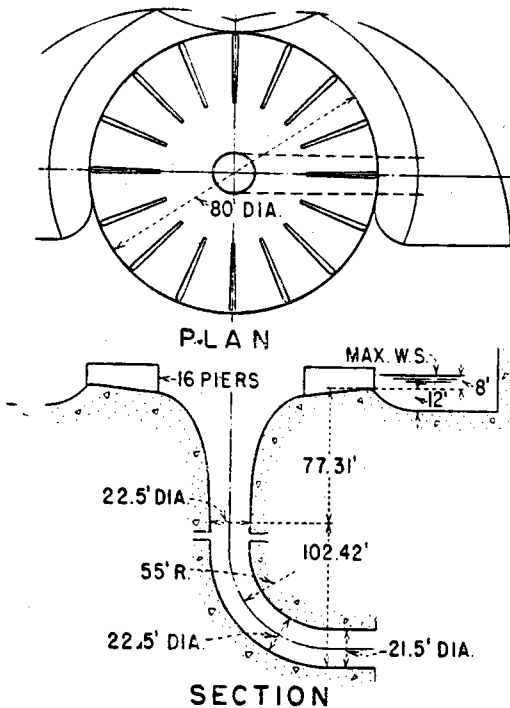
DAVIS BRIDGE DAM SPILLWAY
